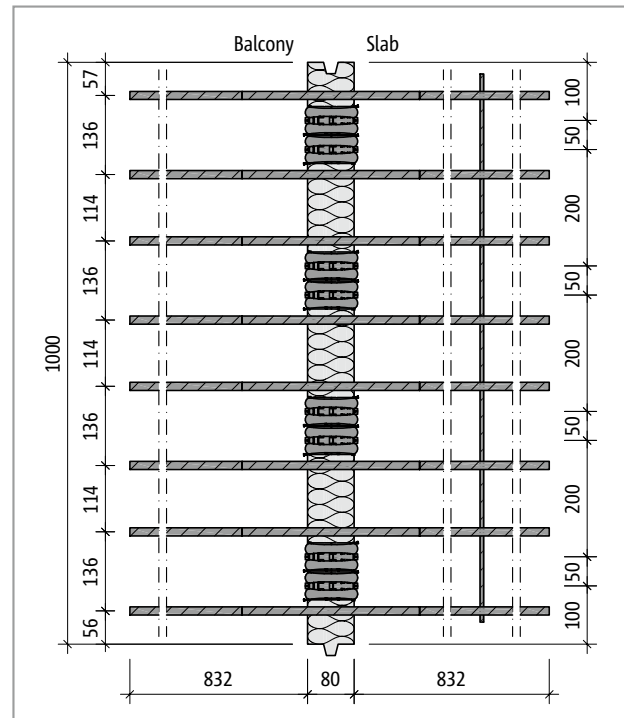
Schöck Isokorb® T type Q-V12: Product layout
